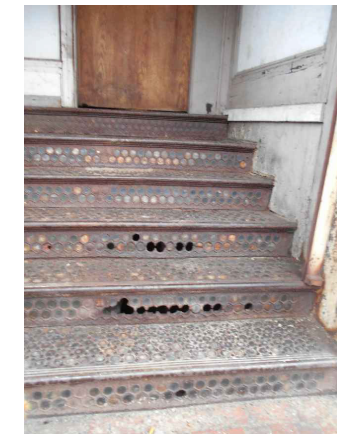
EAST ELEVATION, RESTORE CAST IRON STAIRS WITH PRISM LIGHTS
